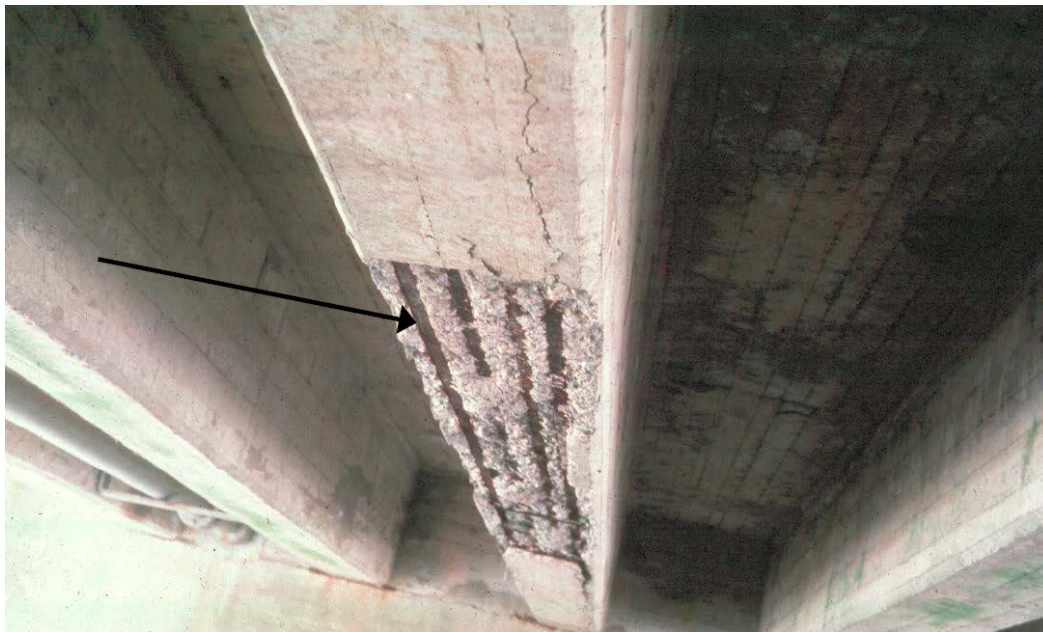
Concrete structure with cracks and tensile steel reinforcement showing [146].
